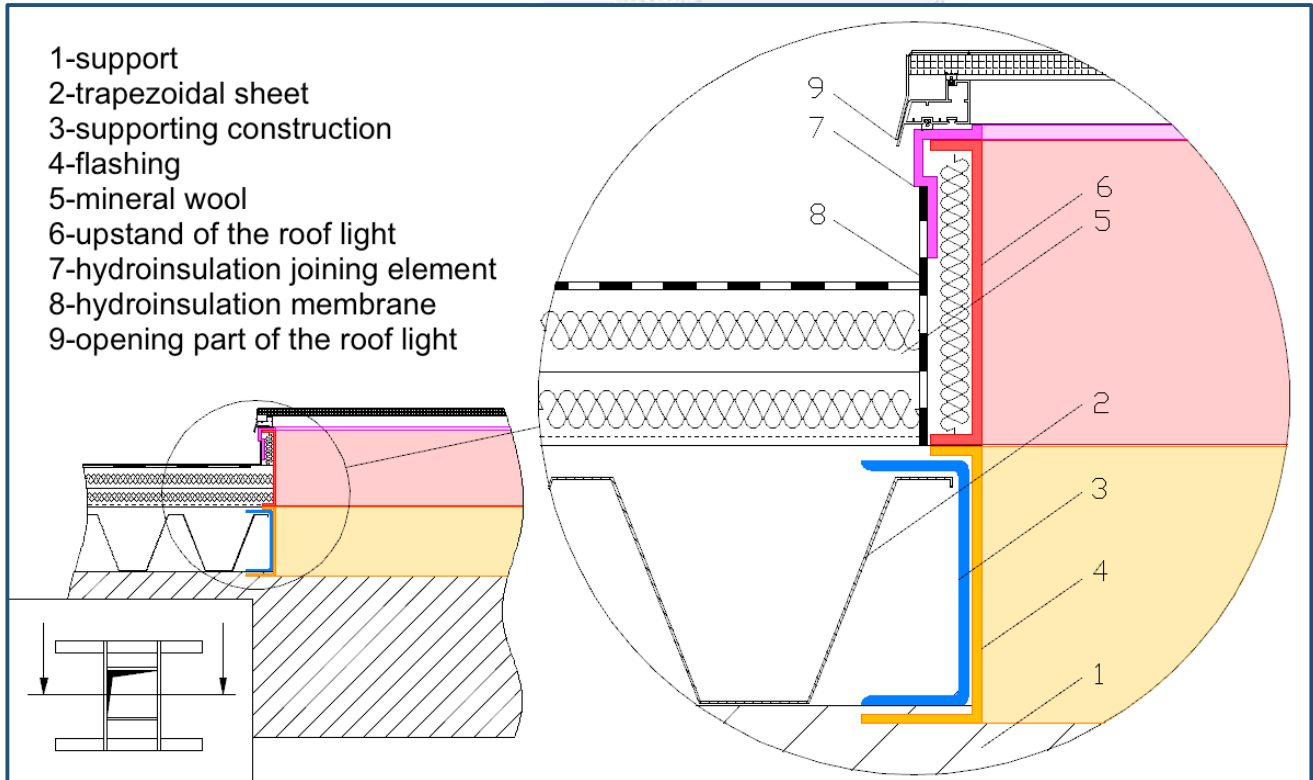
Installation scheme no. 1 - multilayer roof type
